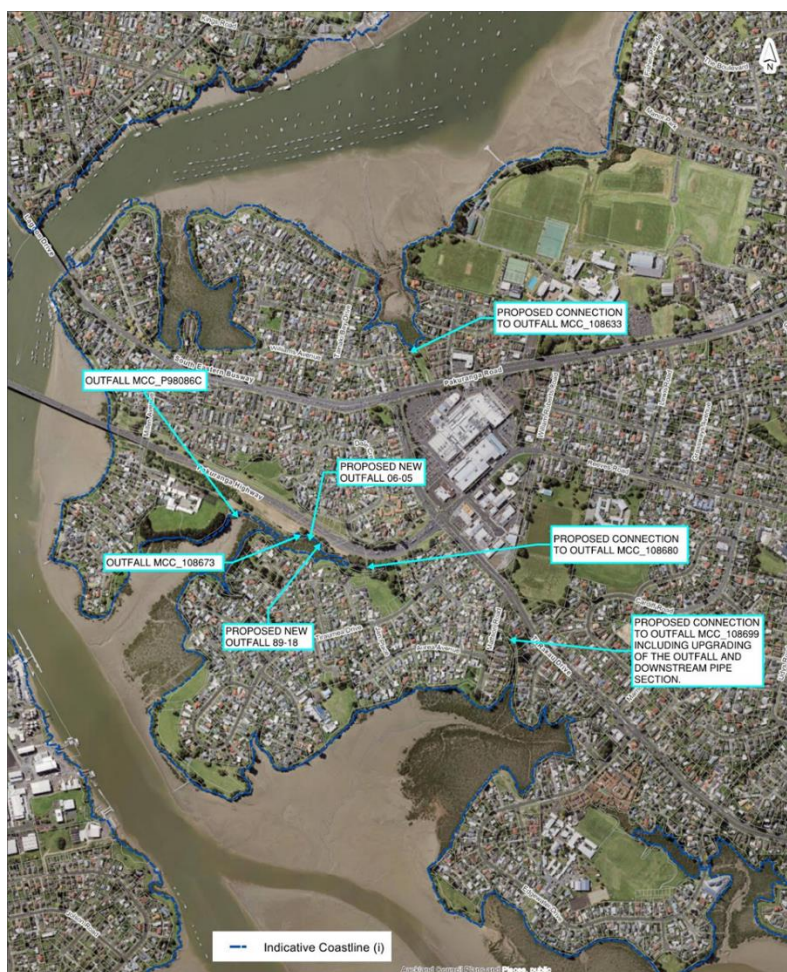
EB2 Stormwater Outfalls (Existing and Proposed)
